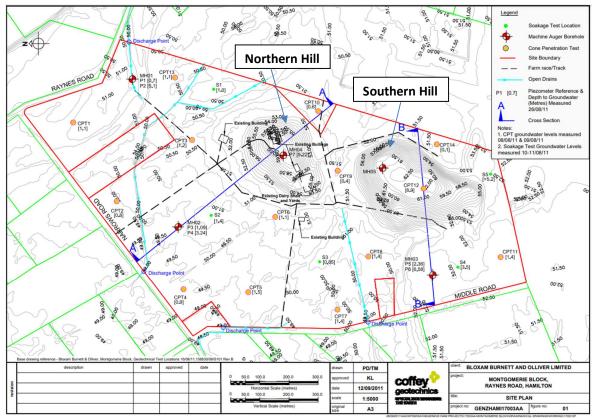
Site Plan with Geotechnical Test Locations (TPL Block)
